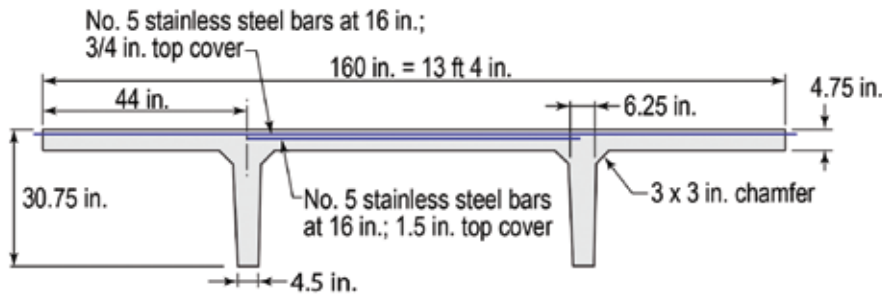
Schematic of the repair completed in Structure B, with 4.75 in. flanges (Note: 1 in. = 25 mm; 1 ft = 0.3 m)
